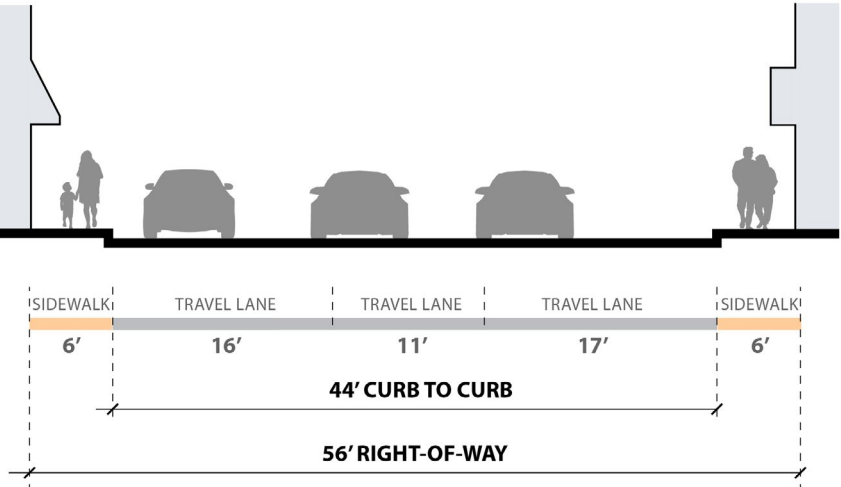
EXISTING STREET CONDITION: BRITTAN AVENUE (BETWEEN LAUREL STREET AND EL CAMINO REAL LOOKING EAST)
